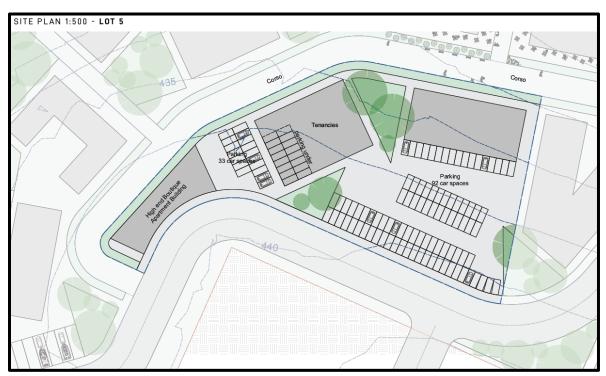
Lot 5 of the Mixed–Use Precincts Site Plan (Source: Robert Harwood Architects)
